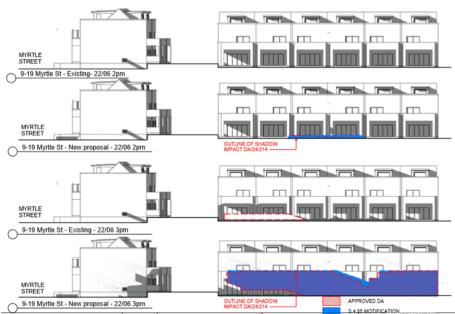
Elevational shadow diagrams at 9-19 Myrtle Street (2pm to 3pm winter solstice)
